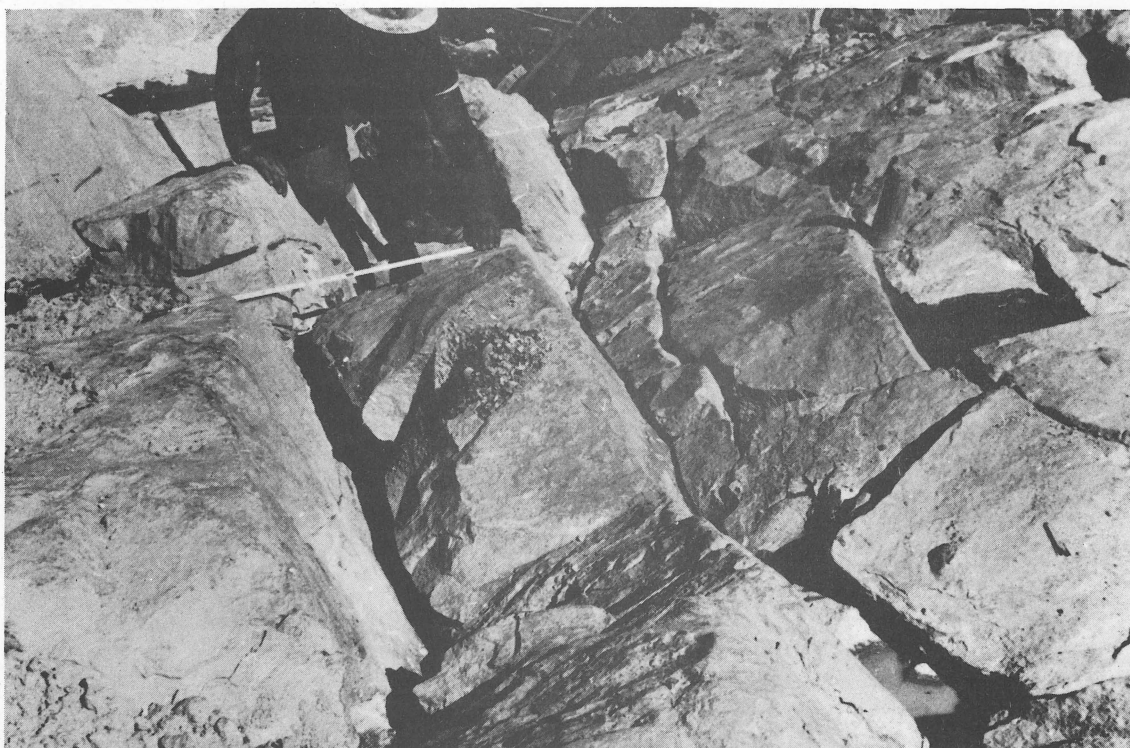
Open bedding plane joints in thickly-bedded quartzite exposed in the valley floor core zone foundations (co-ords 540 E, 1025 N). These joints were backfilled with fine aggregate concrete during foundation treatment.
